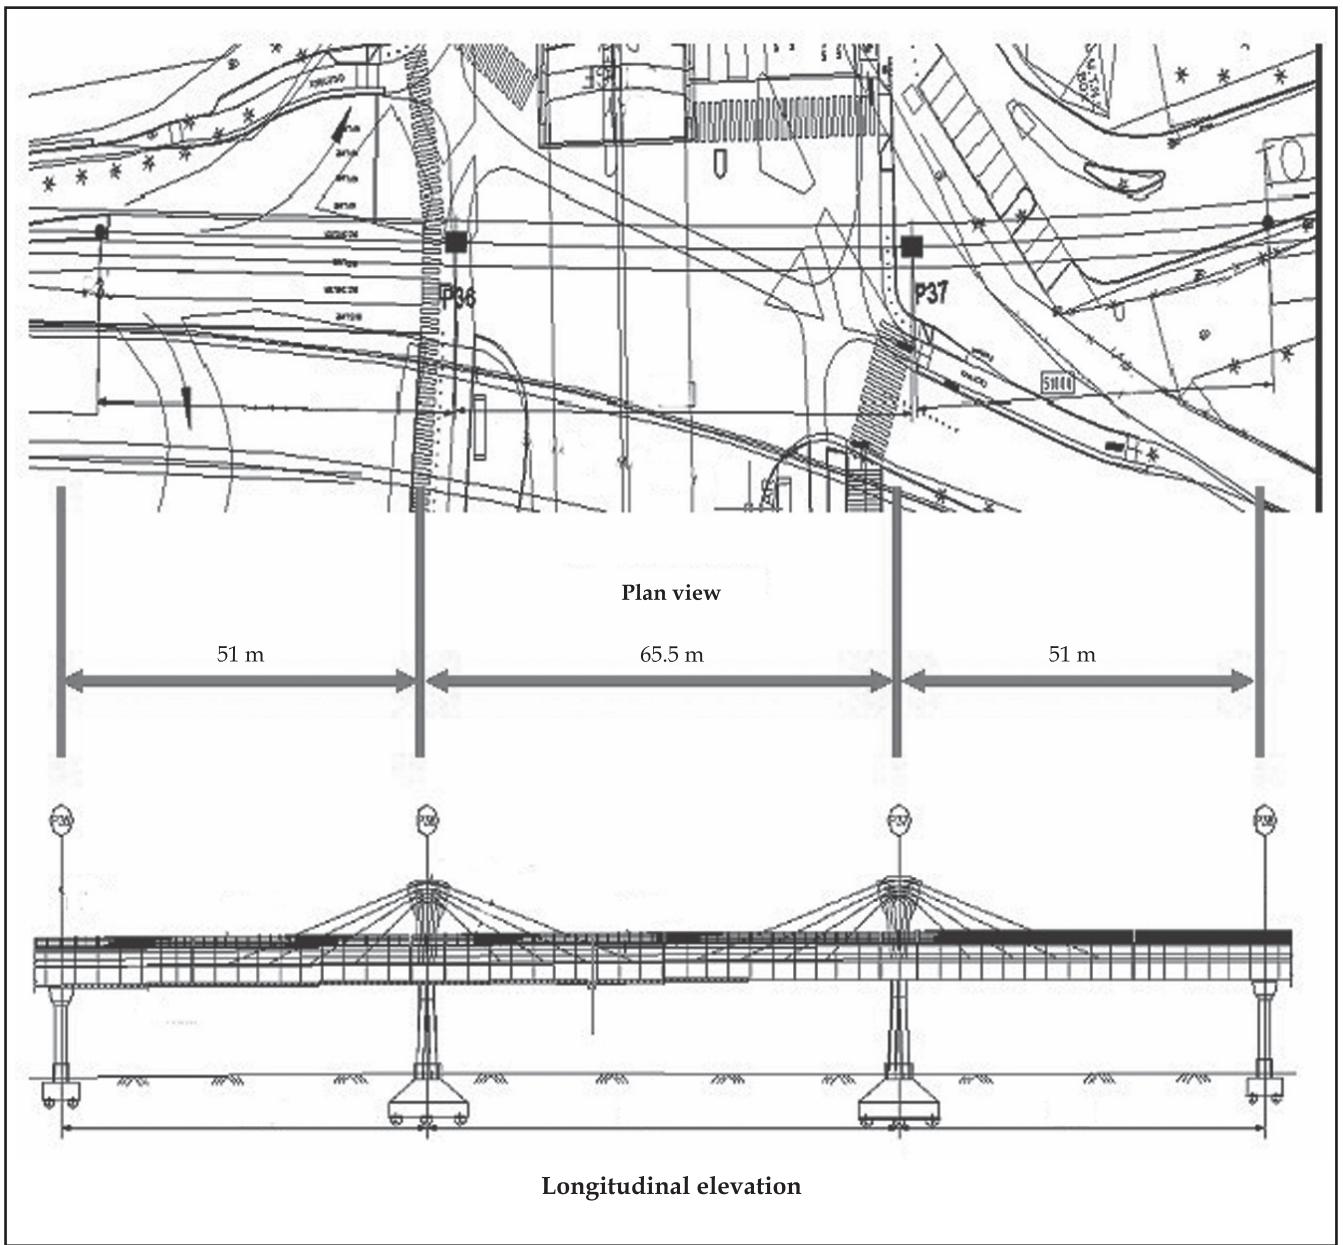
Plan view and longitudinal elevation of the Moolchand bridge
